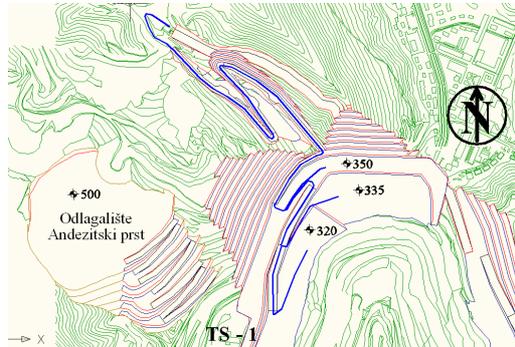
Mining layout of open pit South Mining District at the end of the second year with the presented transport route to the crushing plant Phase 2 (location B)
